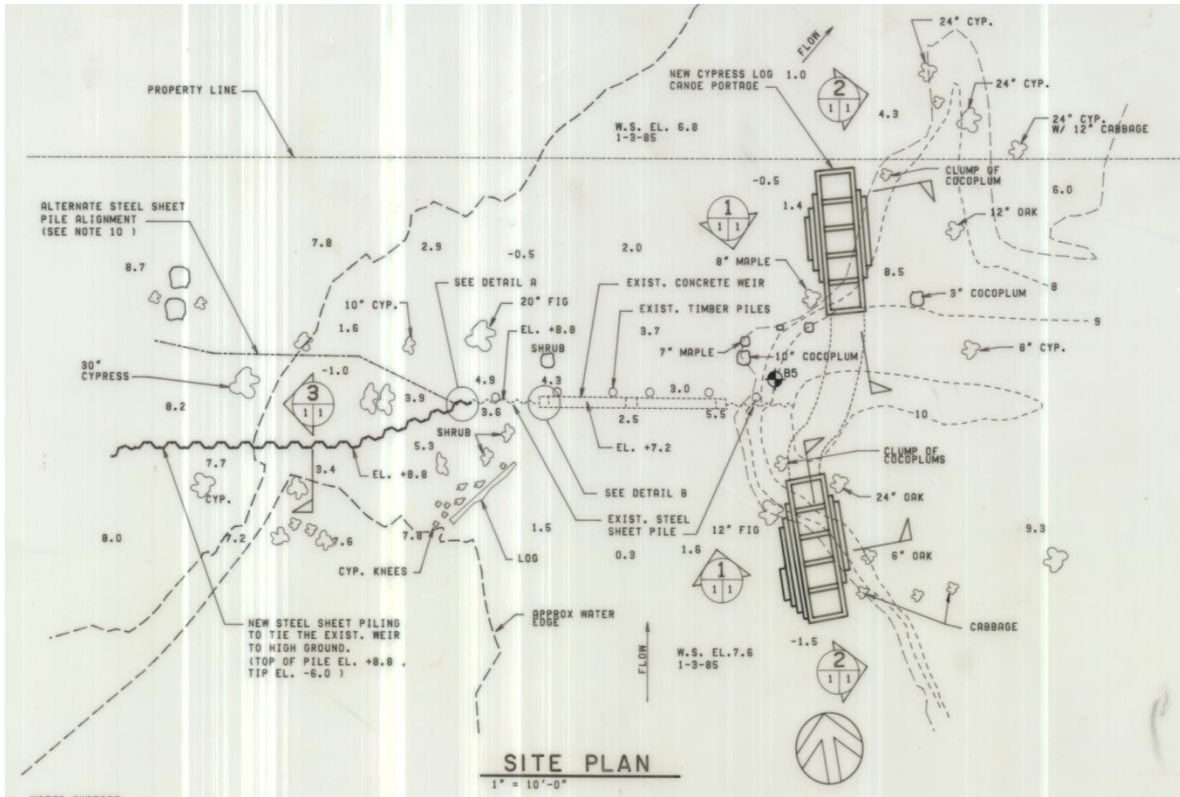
Existing Masten Dam Site Plan (from 1986 repair plans)
